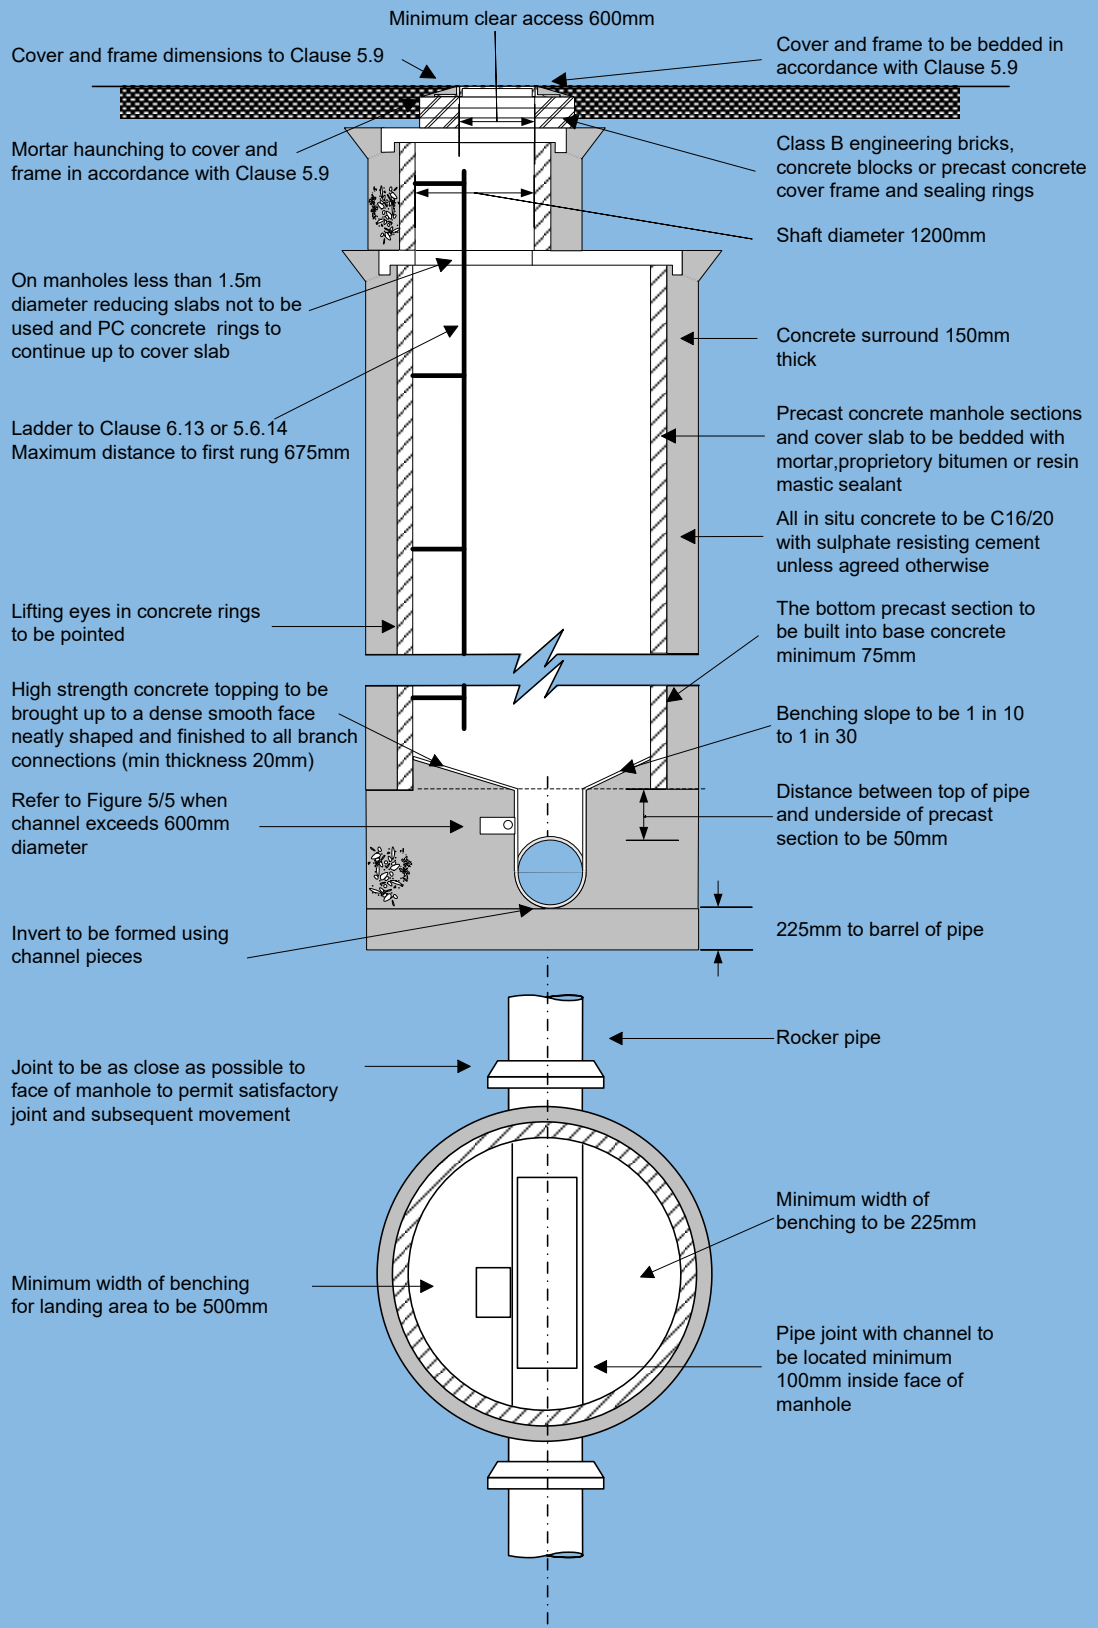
/2 - TYPICAL MANHOLE DETAIL - TYPE B
